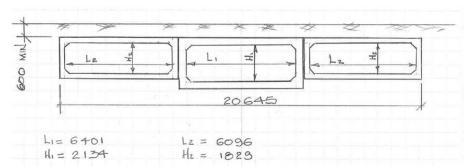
Conceptual Cross-Section for Structural Alternative 2A - South Structure
